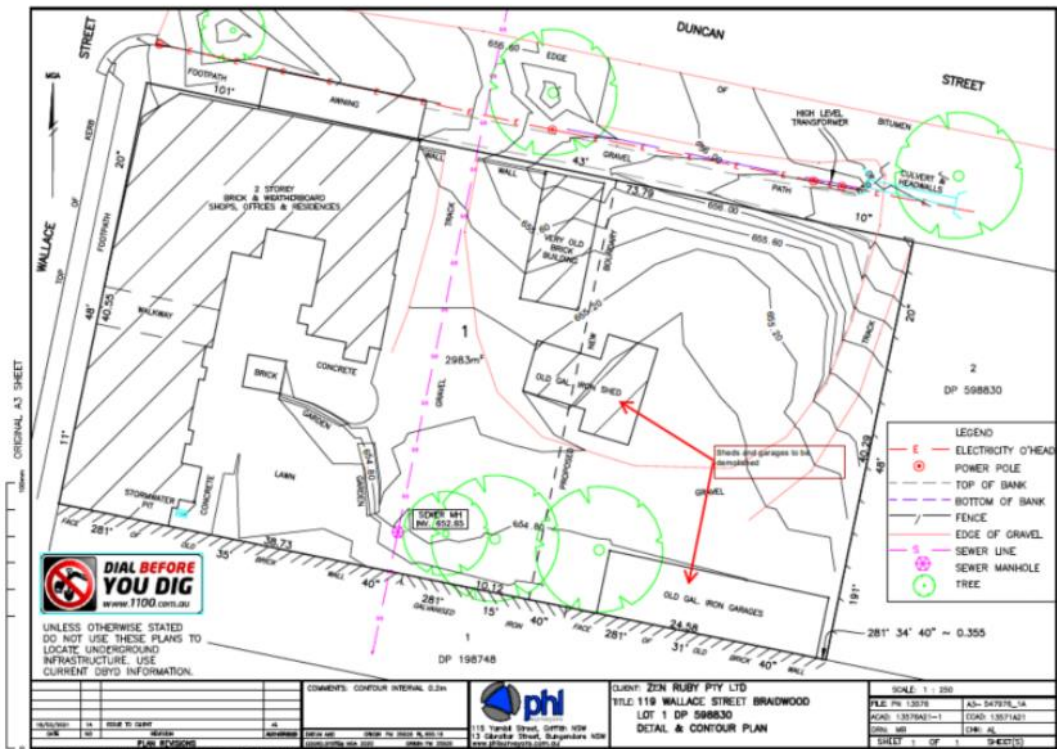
Survey Plan showing proposed subdivision boundary (black) and existing buildings to be demolished labelled.
